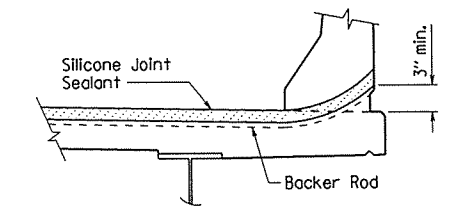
DETAILS FOR BLOCKING EXPANSION JOINT DEVICE
